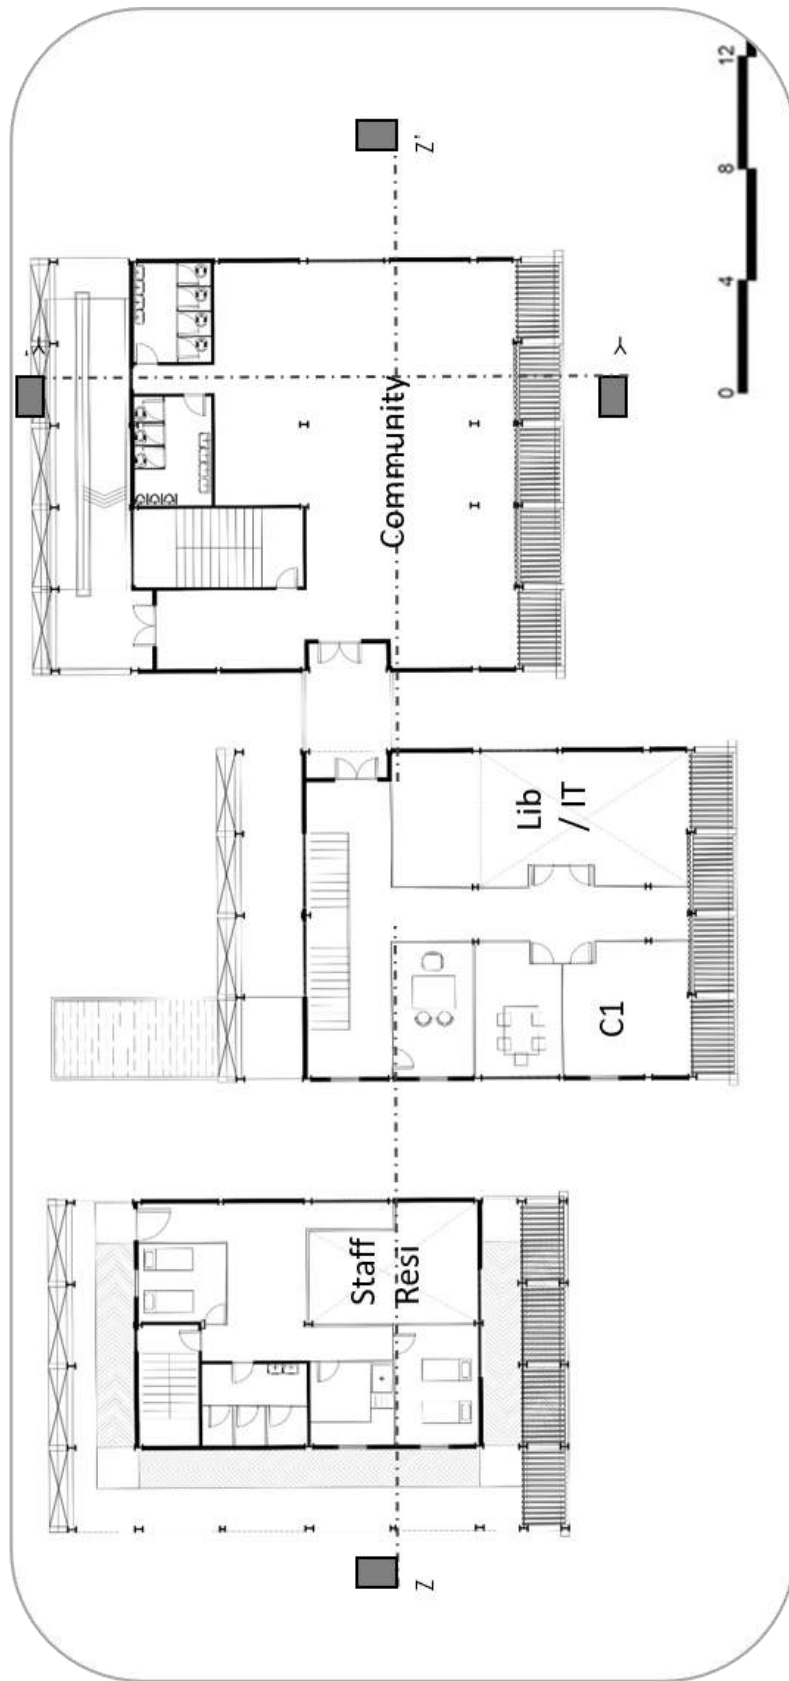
First Floor Plan of Cyclone Shelter (Source: Author)
